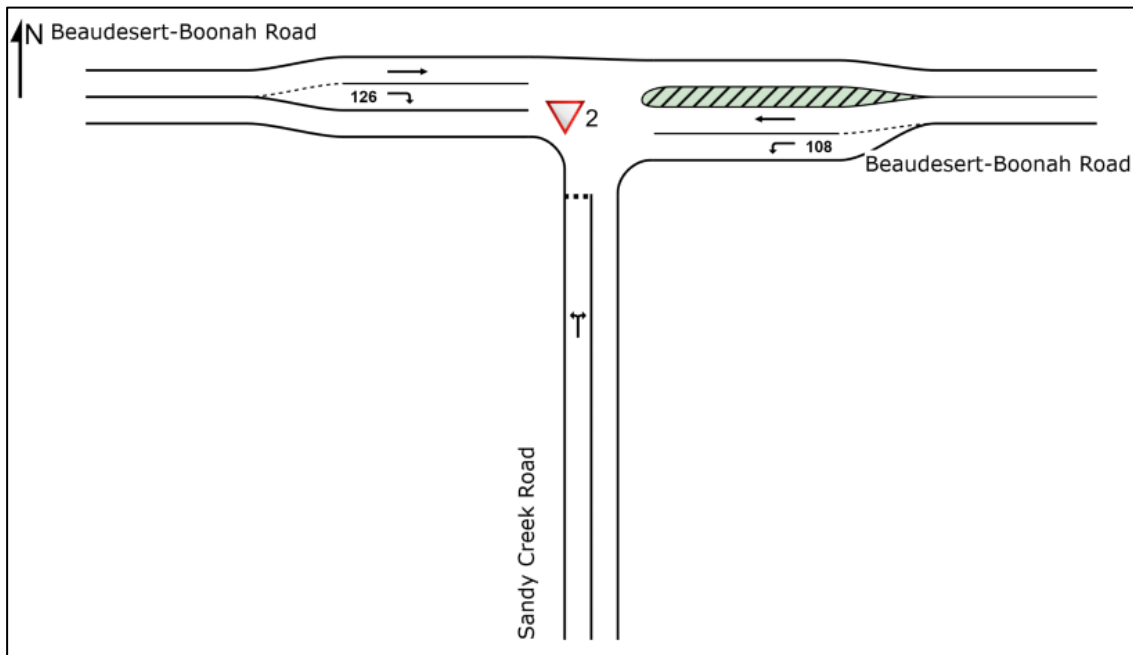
Modelled Existing Configuration of the Beaudesert-Boonah Road / Sandy Creek Road Intersection
